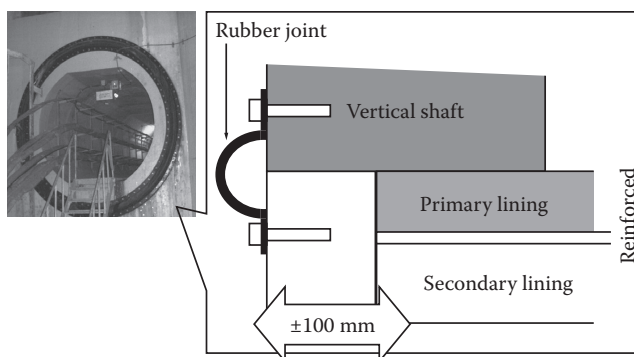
Flexible joint (open-cut cable tunnel).
